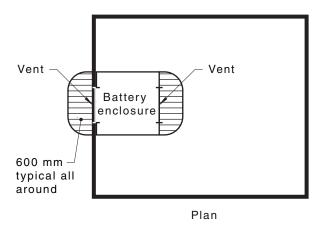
Battery system enclosure within a room where the battery system enclosure is vented to outside the building
